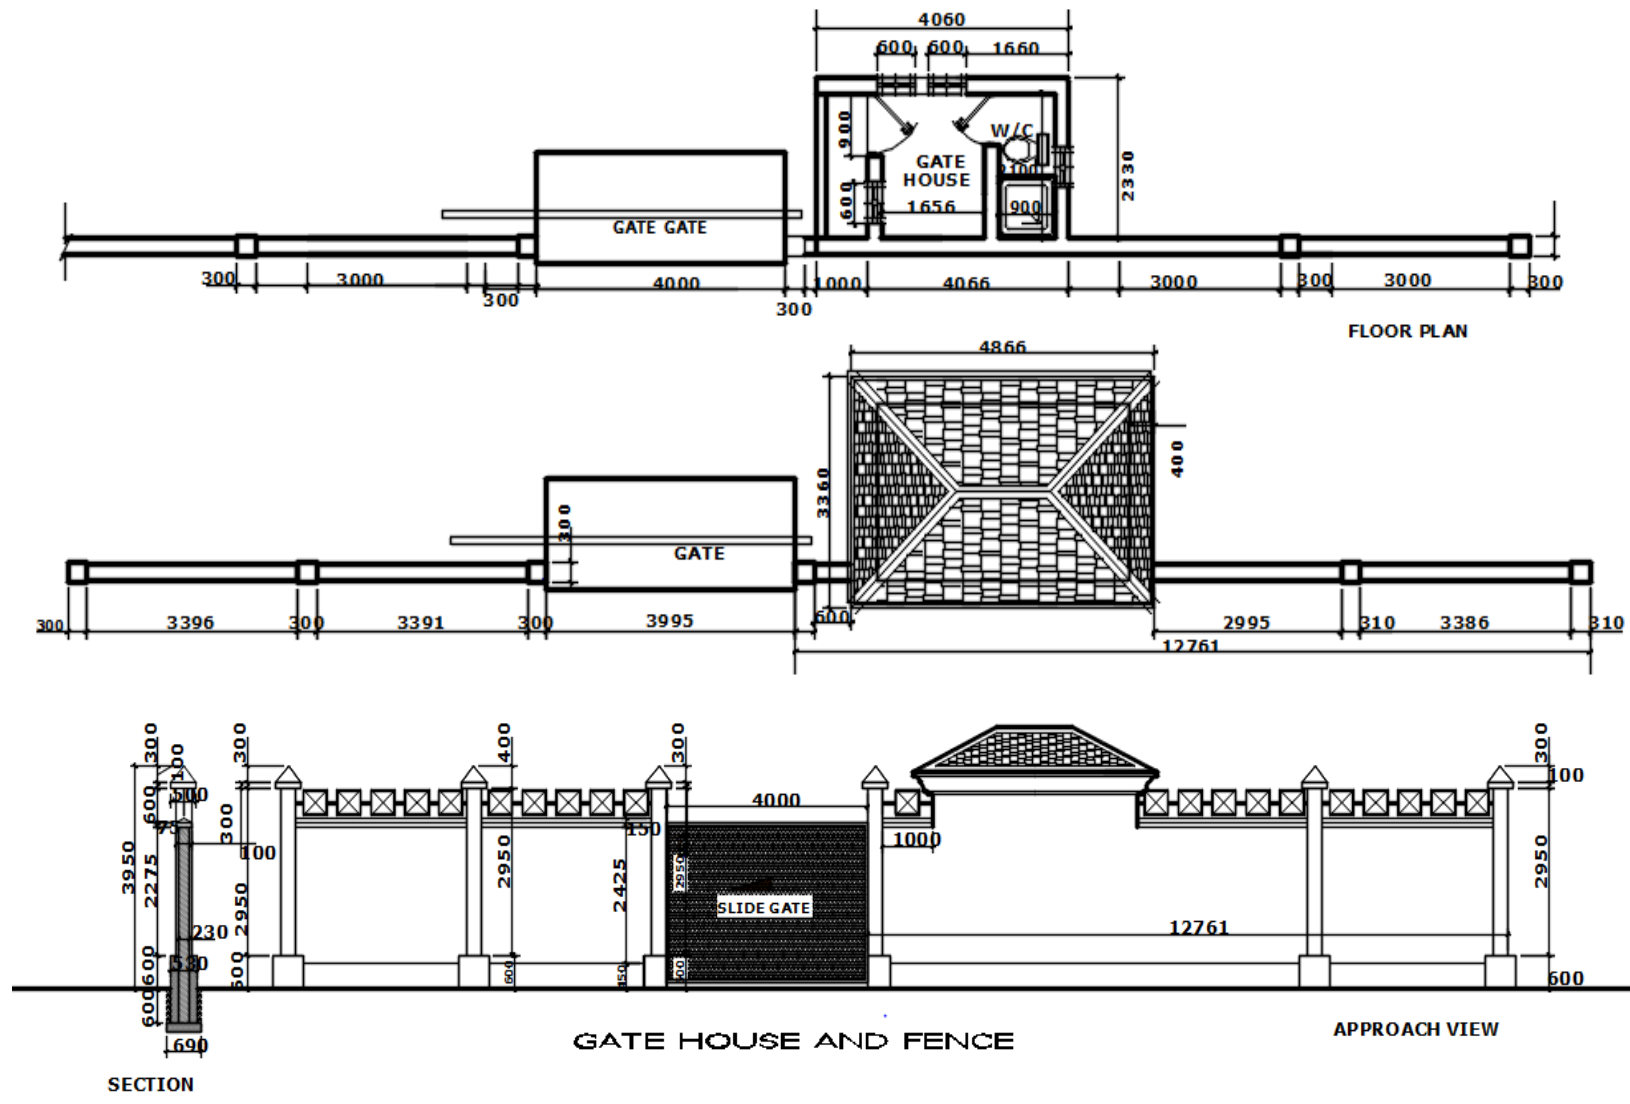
Detailed layout of the substation's gatehouse and fence (all dimensions are in mm)
